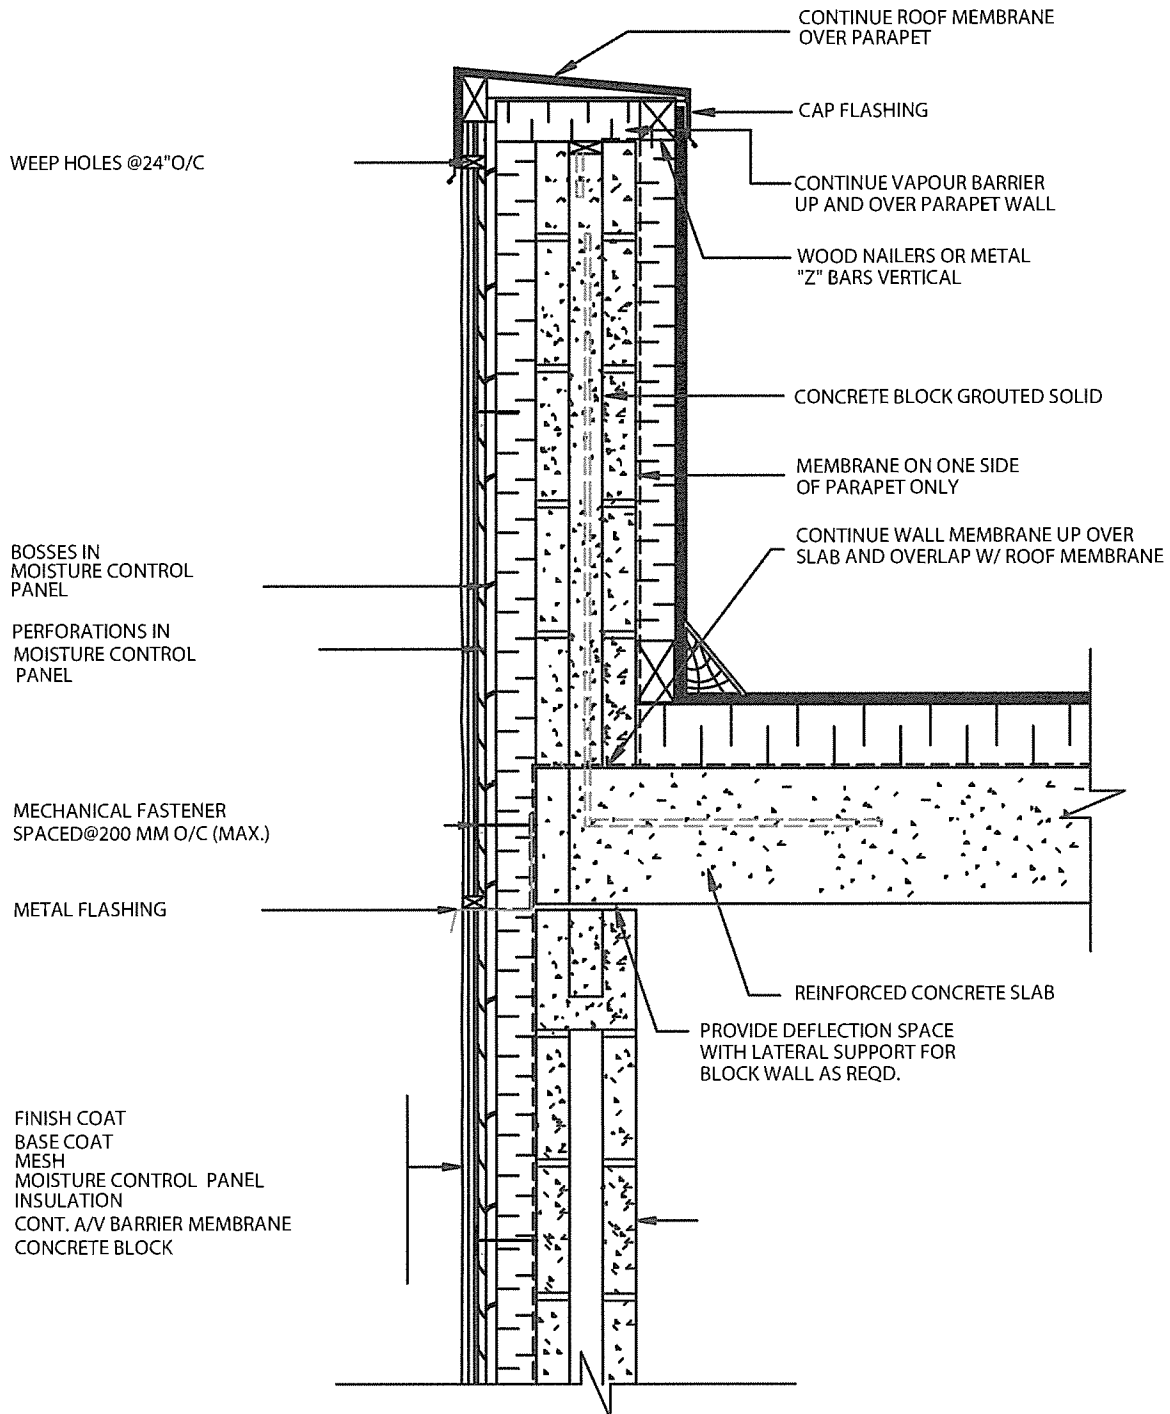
ACRYLIC STUCCO/CONCRETE BLOCK DETAIL AT SLAB EDGE
